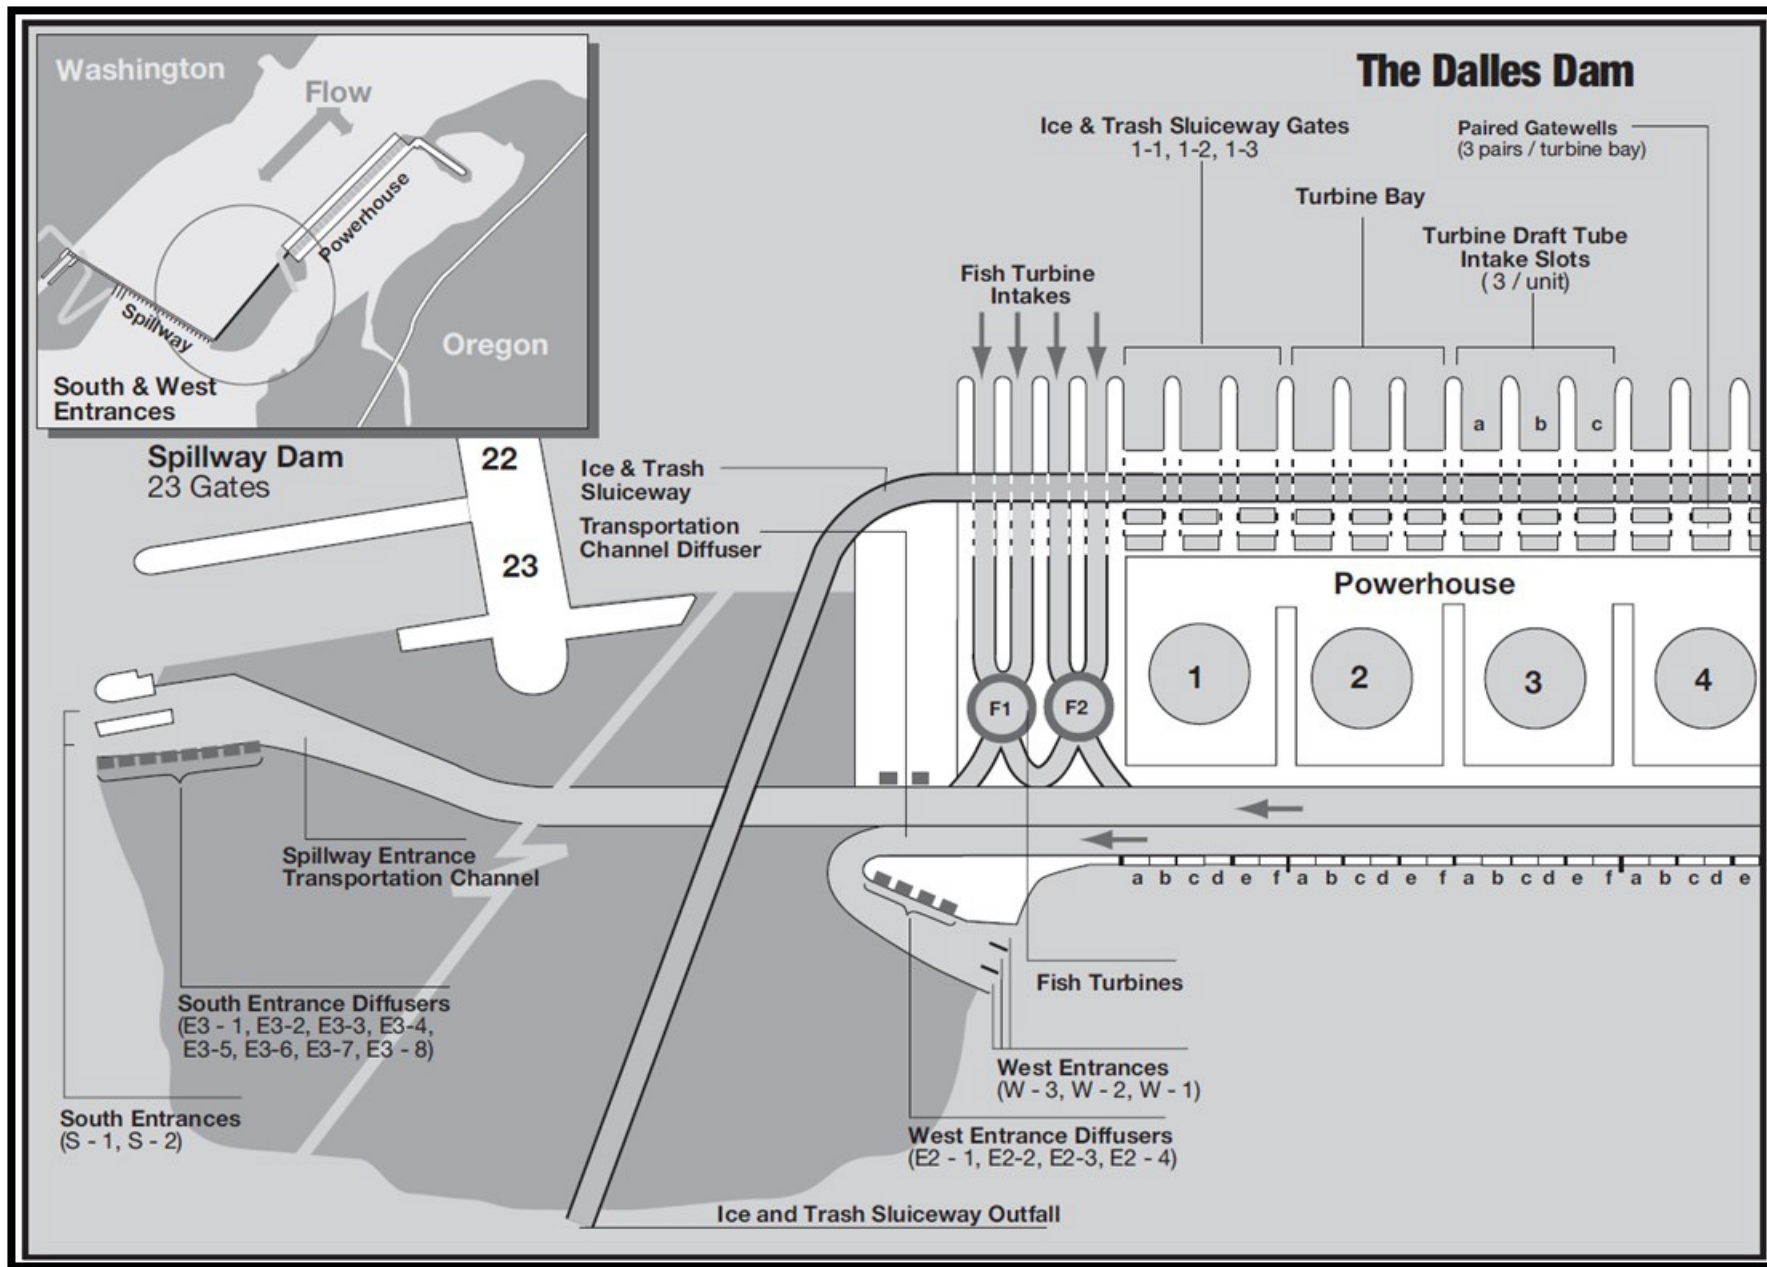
The Dalles Dam South and West Fish Ladder Entrances.
